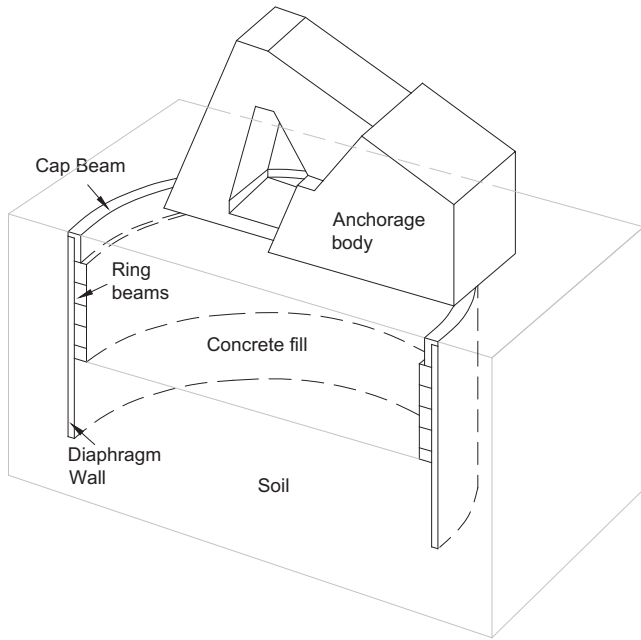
A typical retaining structure for the circular excavation of a suspension bridge anchorage.
